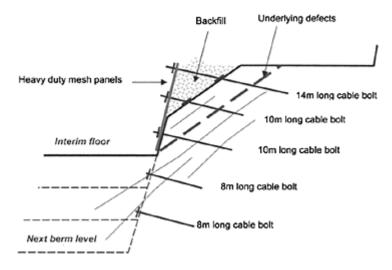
Ramp recovery and batter reinforcement using cable bolts and mesh.
